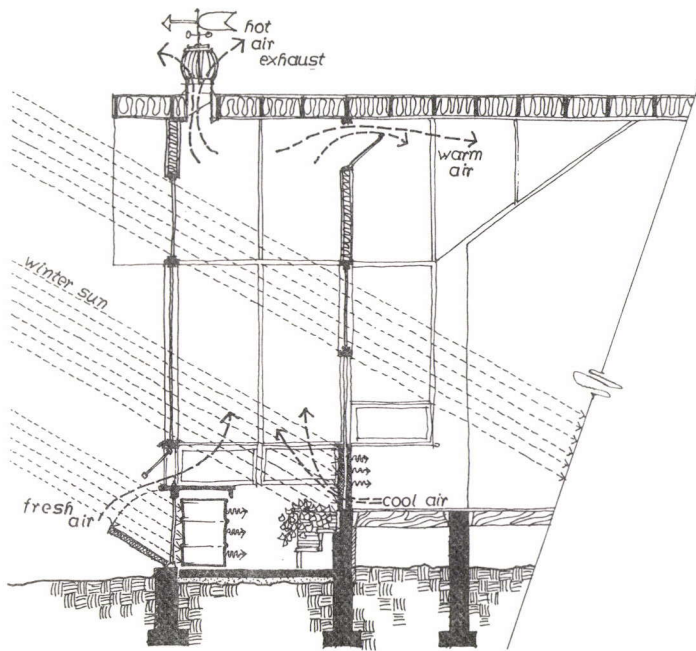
Greenhouse section, Vollmer Schoolhouse renovation
